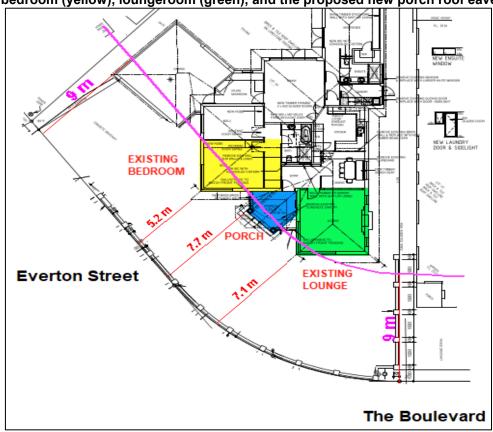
Marked-up floor plan showing minimum primary street setbacks to roof eaves of the existing bedroom (yellow), loungeroom (green), and the proposed new porch roof eaves (blue).
